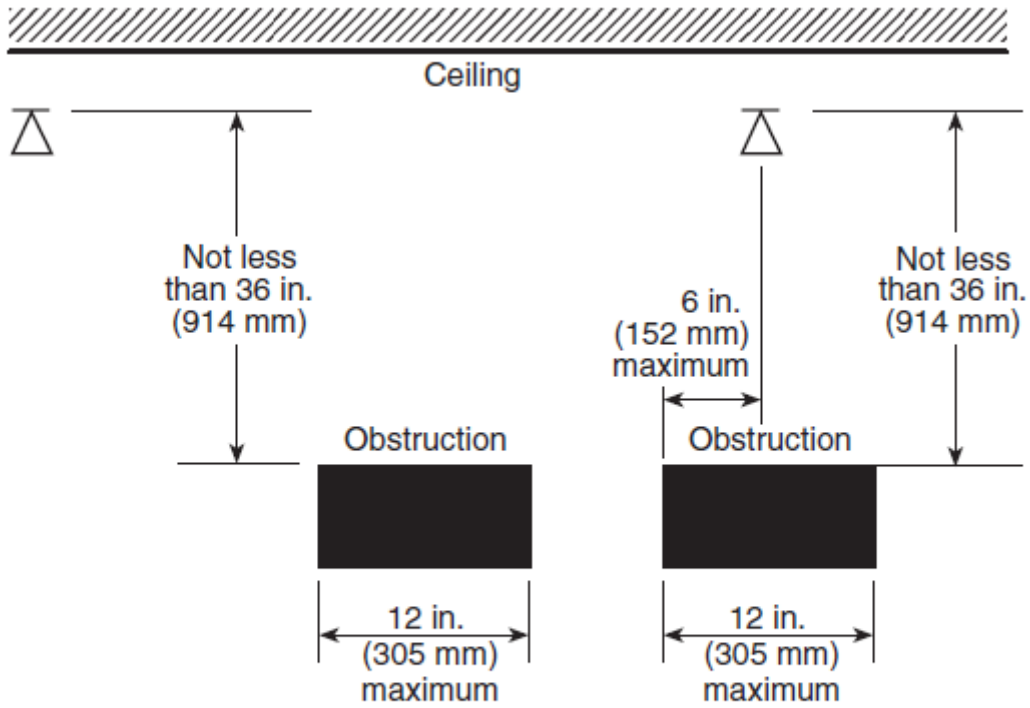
Obstruction More Than 36 in. (914 mm) Below Sprinklers (CMSA Sprinklers).
